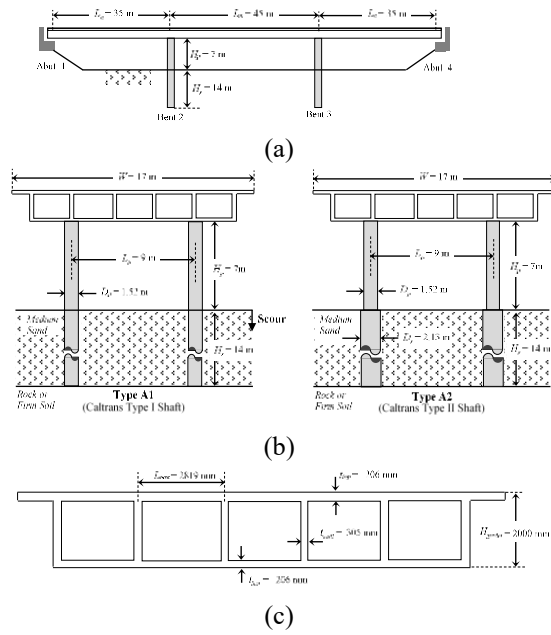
Schematics of Type A1 and Type A2 bridges; (a) elevation, (b) substructures, and (c) cross-section of box-girder
